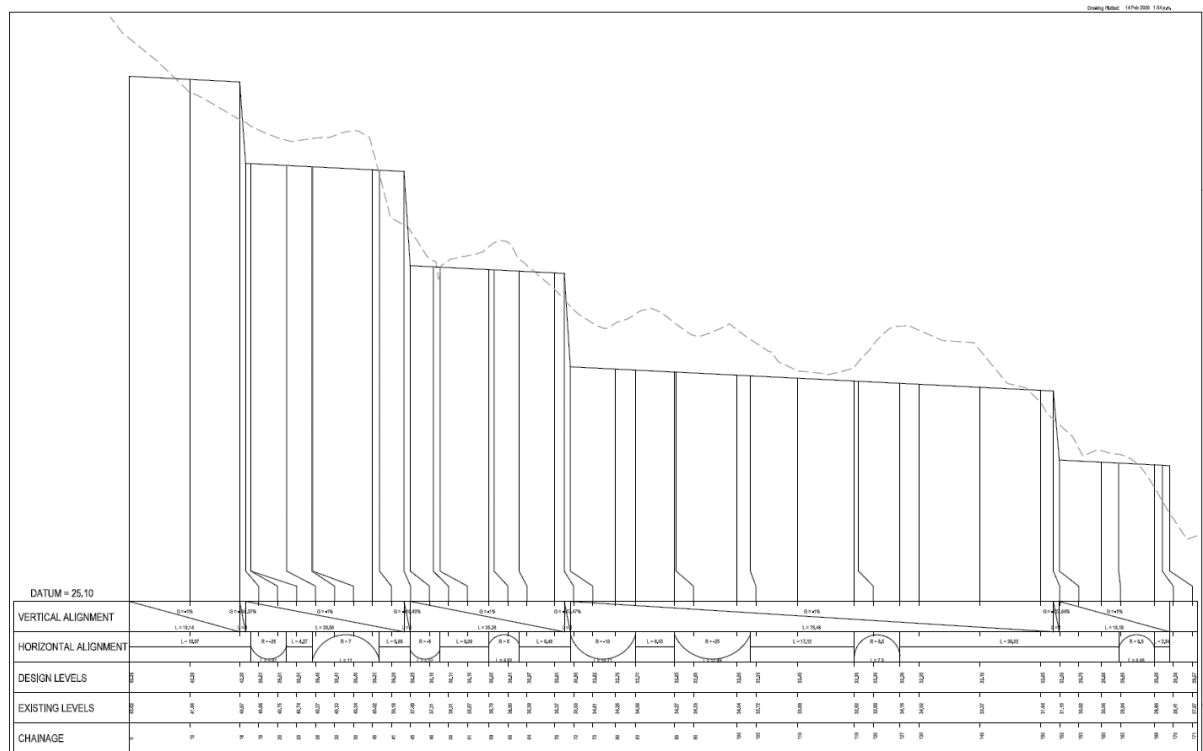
Plan showing vertical realignment of stream from Beca: Concept design open channel long section 044-RCT_401_C3-061 rev. C
